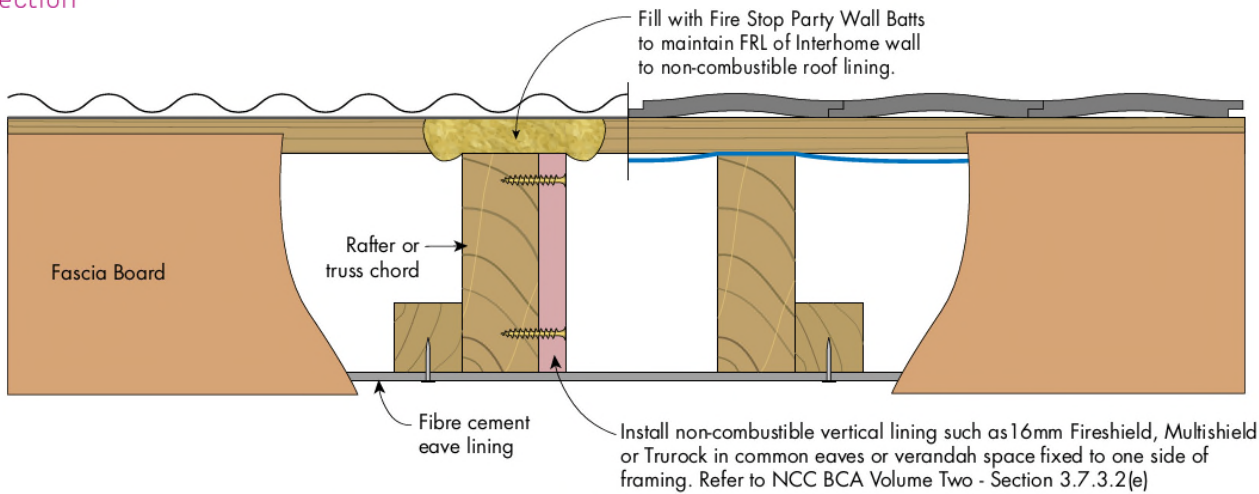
Interhome over Eave End Detail for Class 1 Buildings
